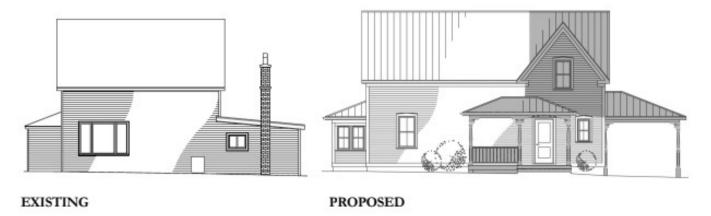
Existing and Proposed north elevation, Mikaela Hughes Architect, 2024
